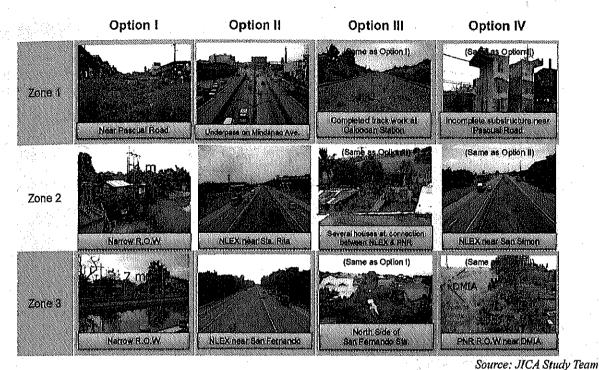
Typical Existing ROW Conditions Photographs of Each Route
